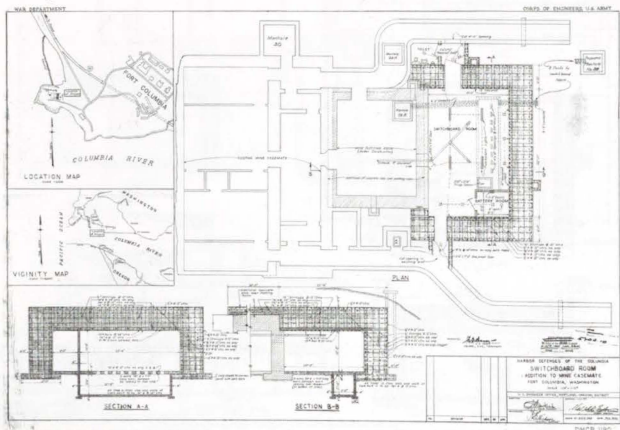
(Below). May 1942, construction already underway, shows plan as built.
